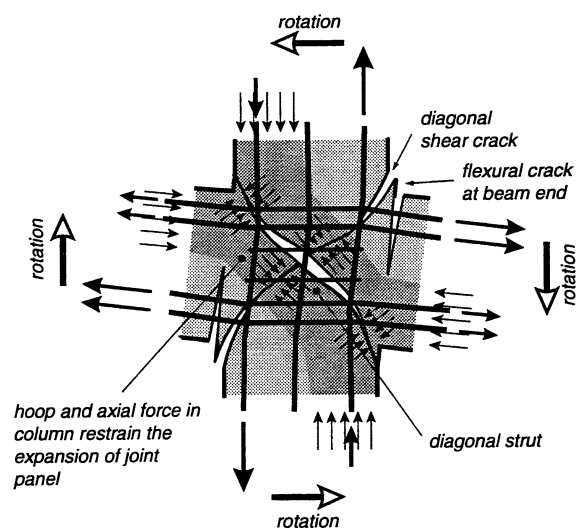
Behavior model for joint shear failure and force flow in beam-column connection
